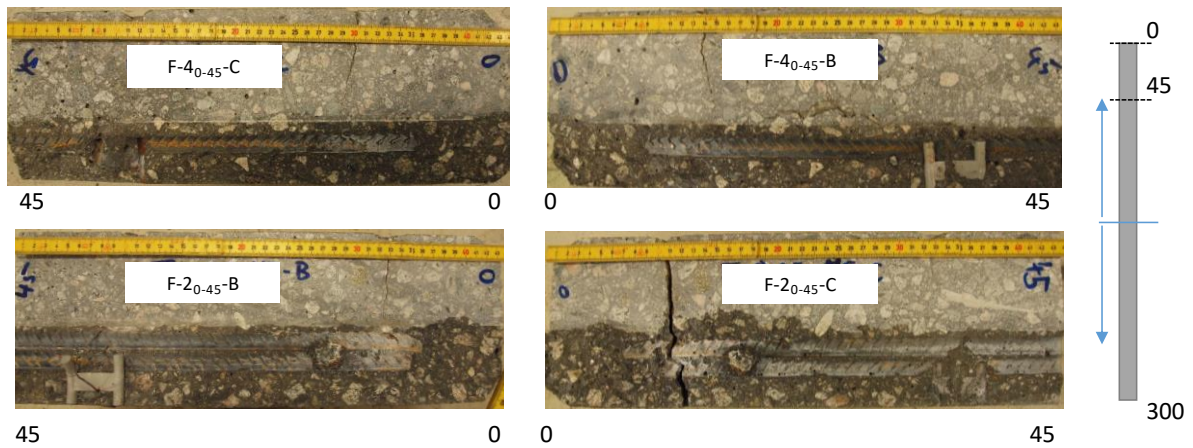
Steel-concrete interface of beam F section 0 to 45 cm. Crack close to the hanging-screw which presented white precipitate and spread on steel-concrete interface. Superficial rust
